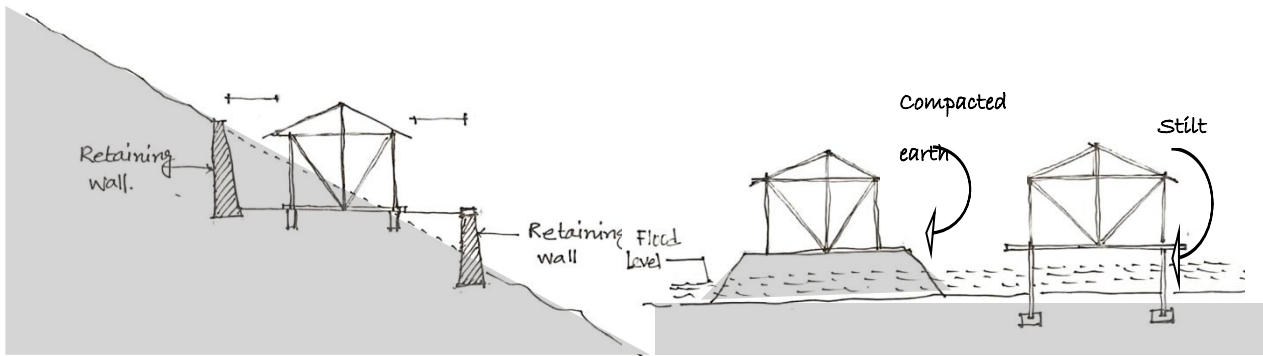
Site protection from natural disaster. (a) Protecting site and structure by retaining wall in hilly area, (b) Raising structure on compacted earth or stilts in flood prone areas. Source: Housing and Building Research Institute, 2018. Sketch: Author, 2021
